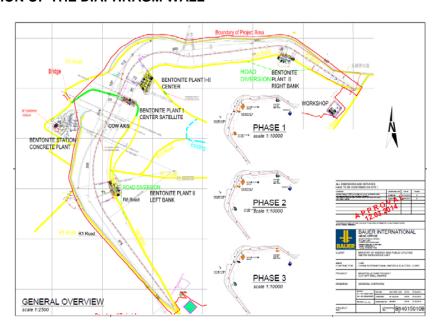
General Overview of the Dam Layout with Left Bank, Central Part and Right Bank
